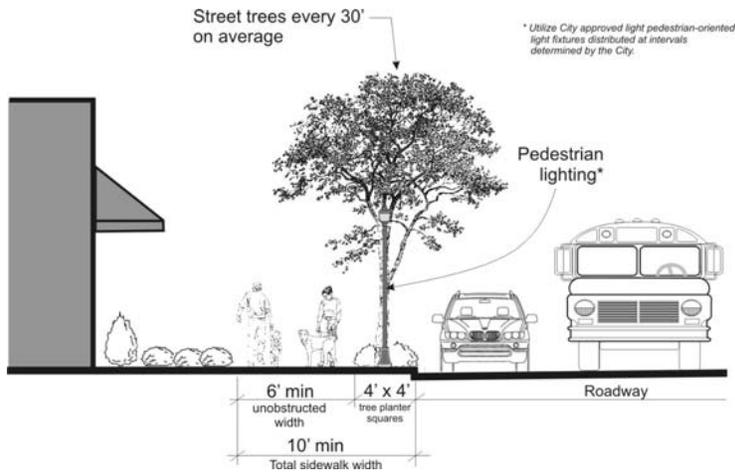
Minimum sidewalk standards for designated Secondary Streets.
